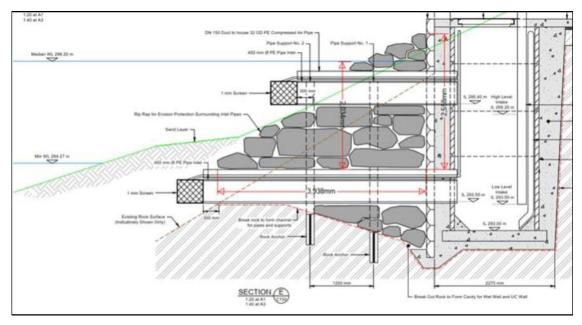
Section of the water intake and station, showing the deepest extent of rip rap to protect the intakes.
